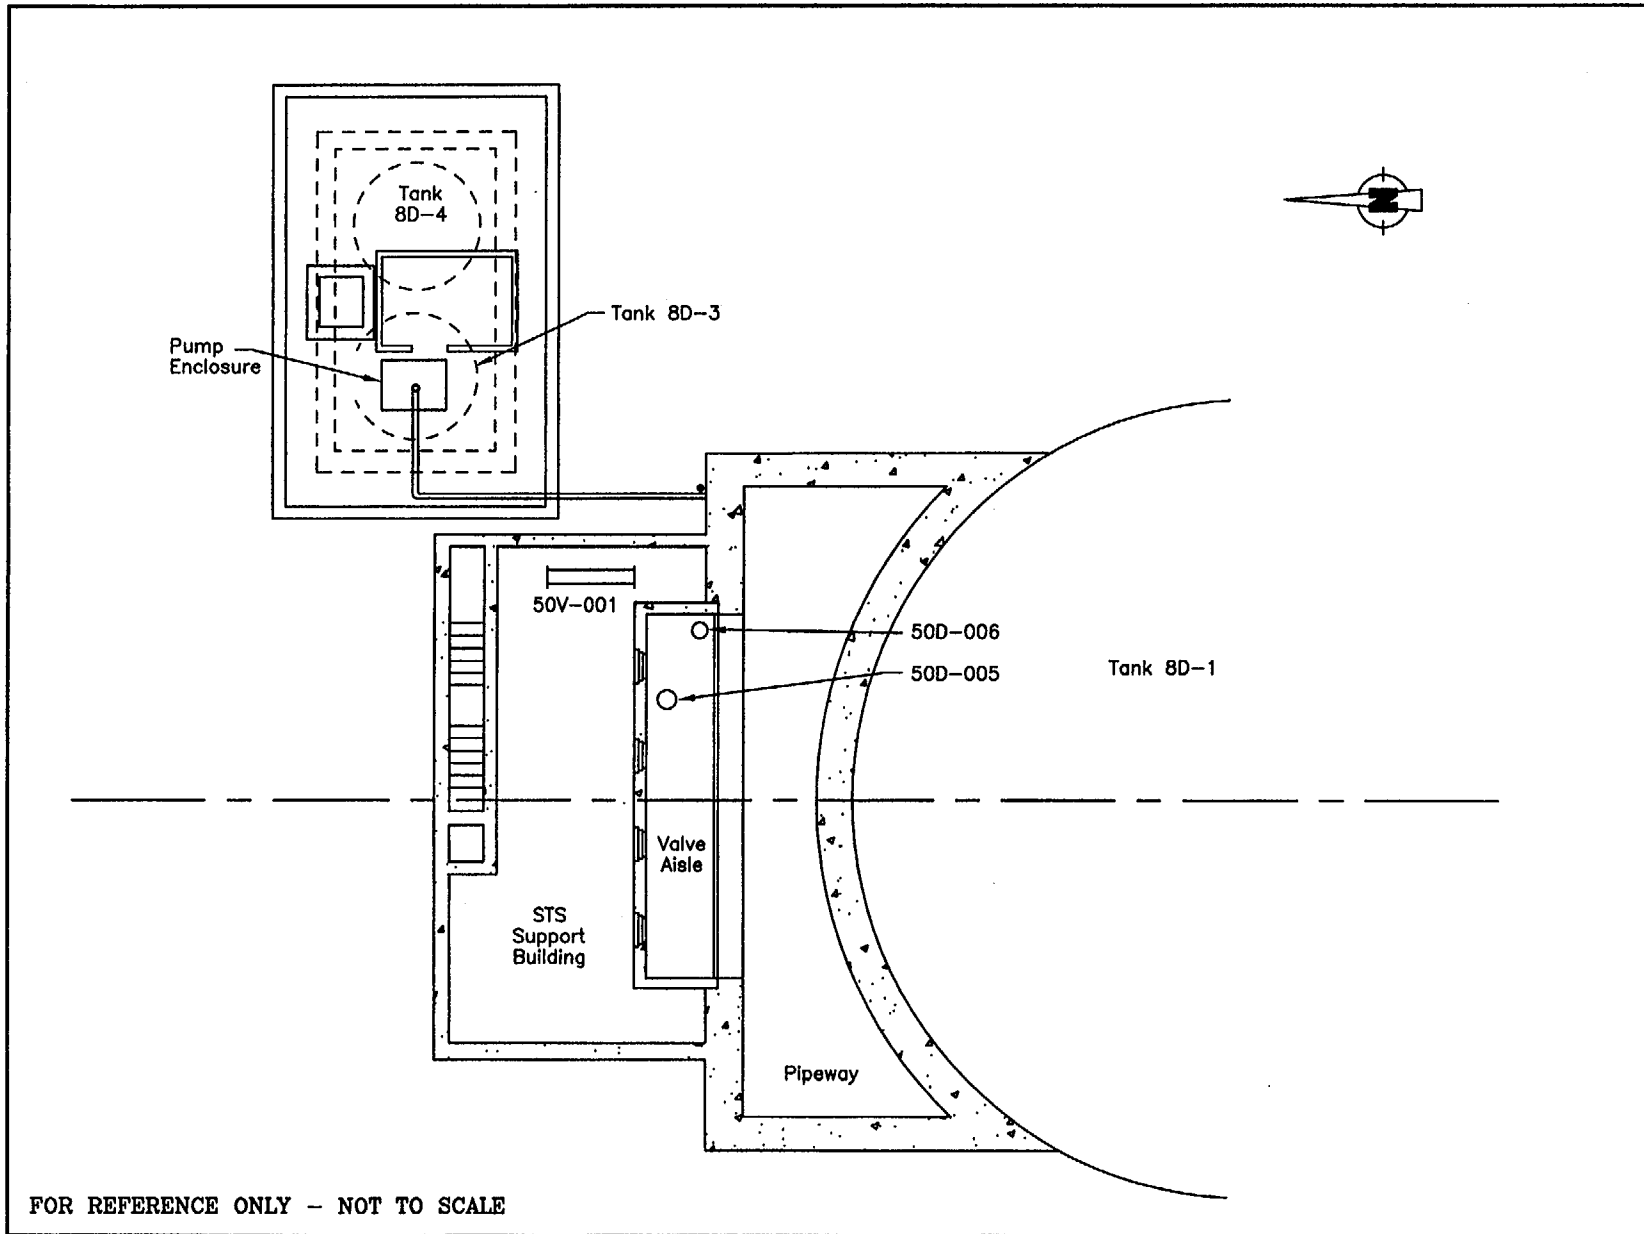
General Arrangements STS Building and 8D-3 & 4 Tanks - Plan Elevation 92.0'
